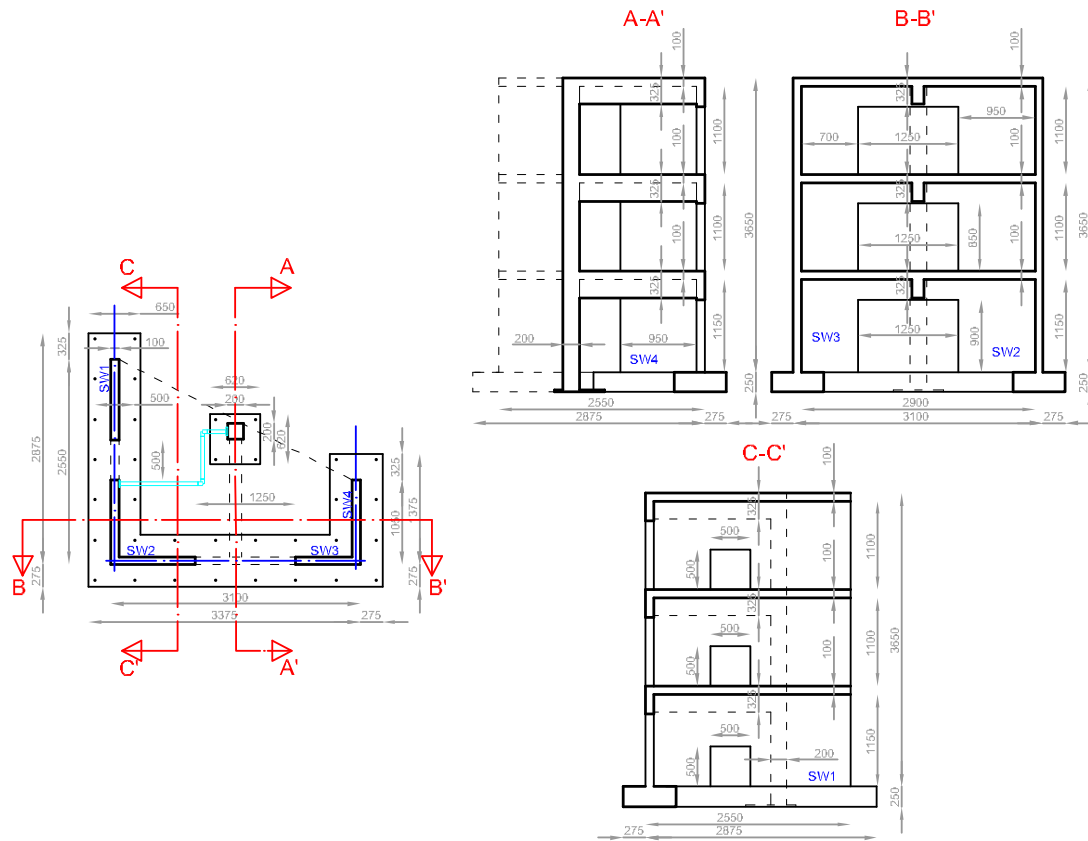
Formwork drawing of the SMART 2013 test specimen — dimensions in millimeters.
